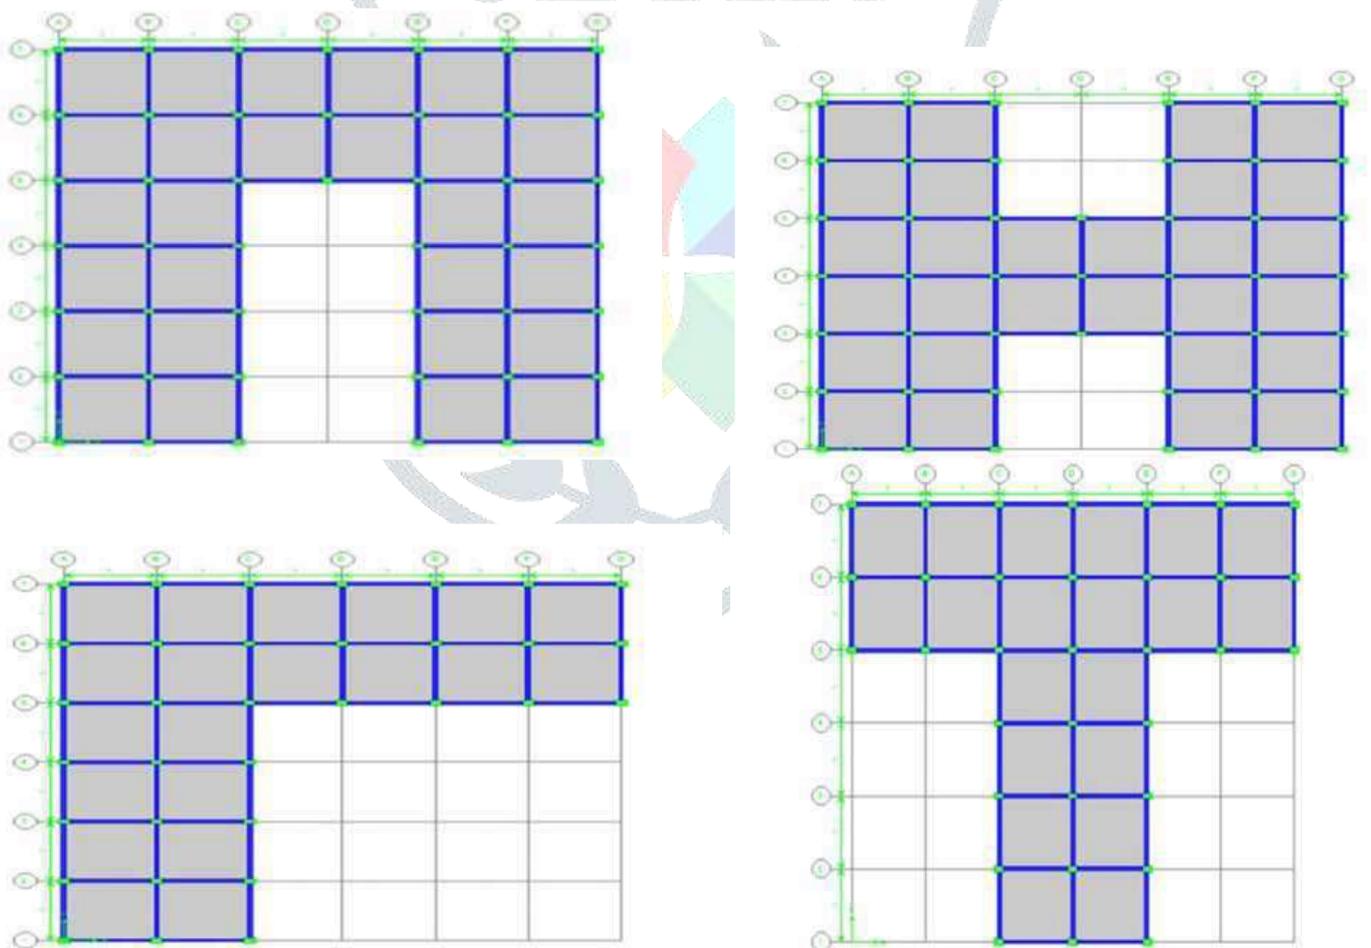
Top View of Plan Irregular Models (PI-1, PI-2, PI-3, PI-4)
